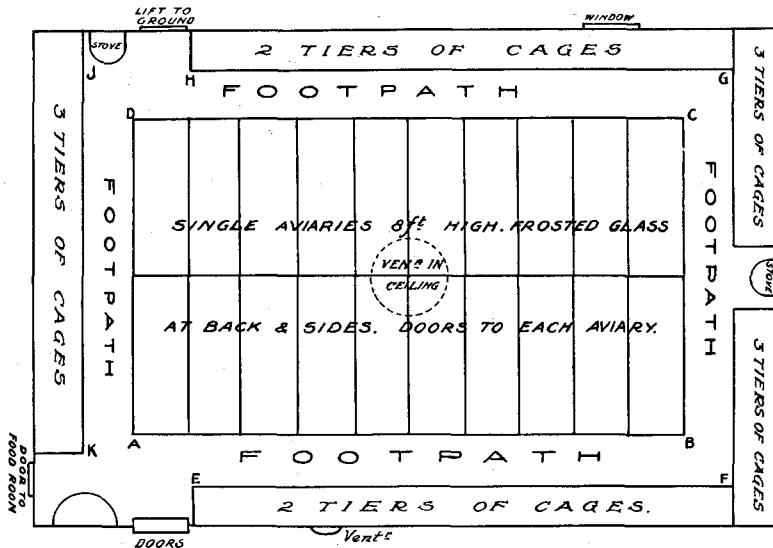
PLAN OF MRS. DALTON-BURGESS'S BIRD-ROOM.
